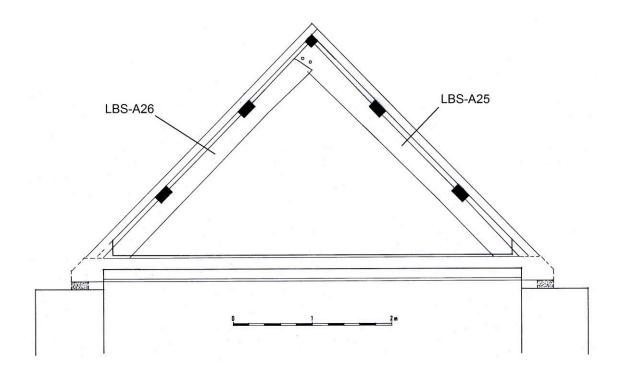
Central hall/parlour range; truss I (east face), showing the location of samples LBS-A25 and LBS-A26 (Martin Roberts)
